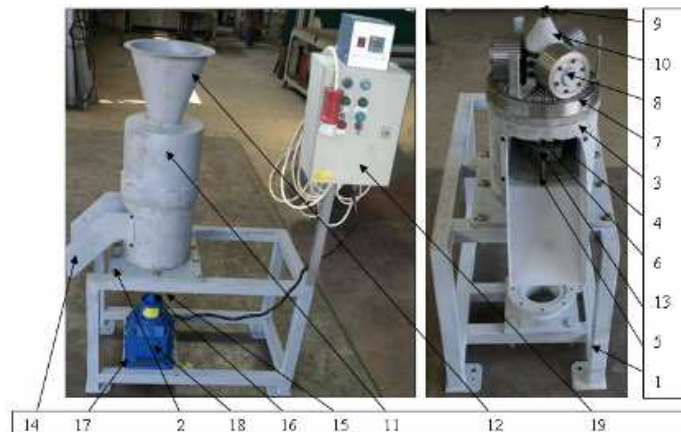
Pelleting equipment/ Echipamentul de peletizare - EP-0
